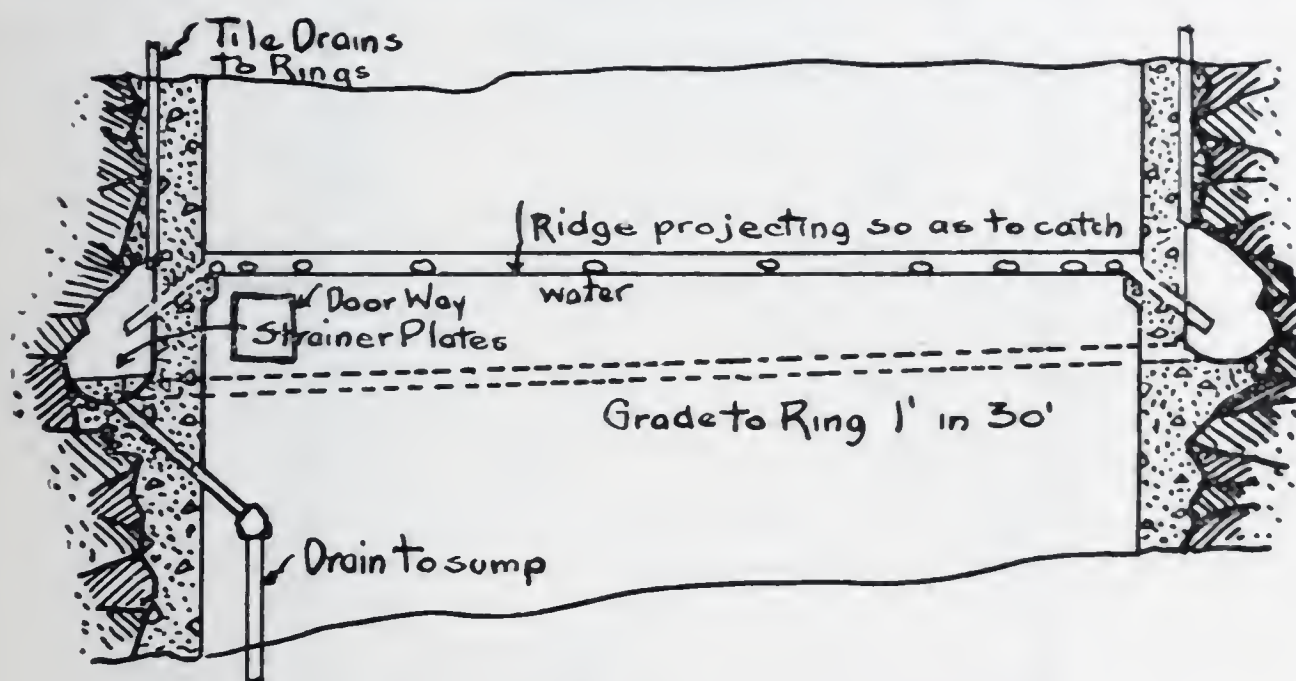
Typical Ring in Concrete-Lined Shafts.
